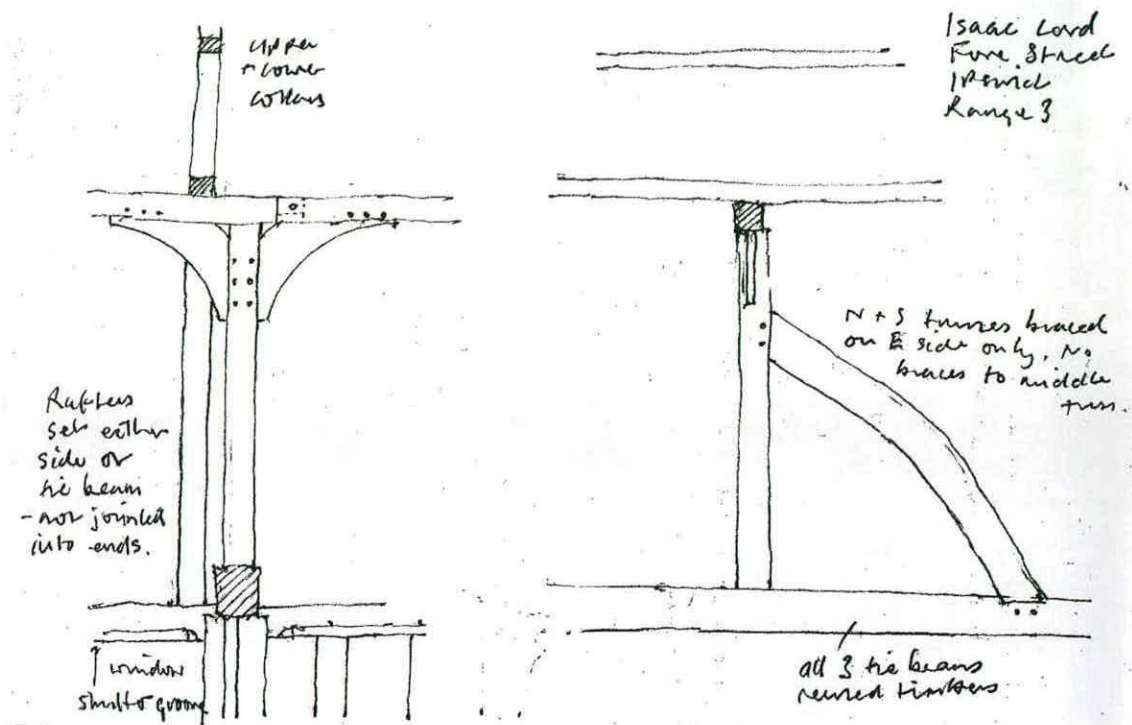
Range 3 (Sale Room). Details of crown post roof (survey drawing)
